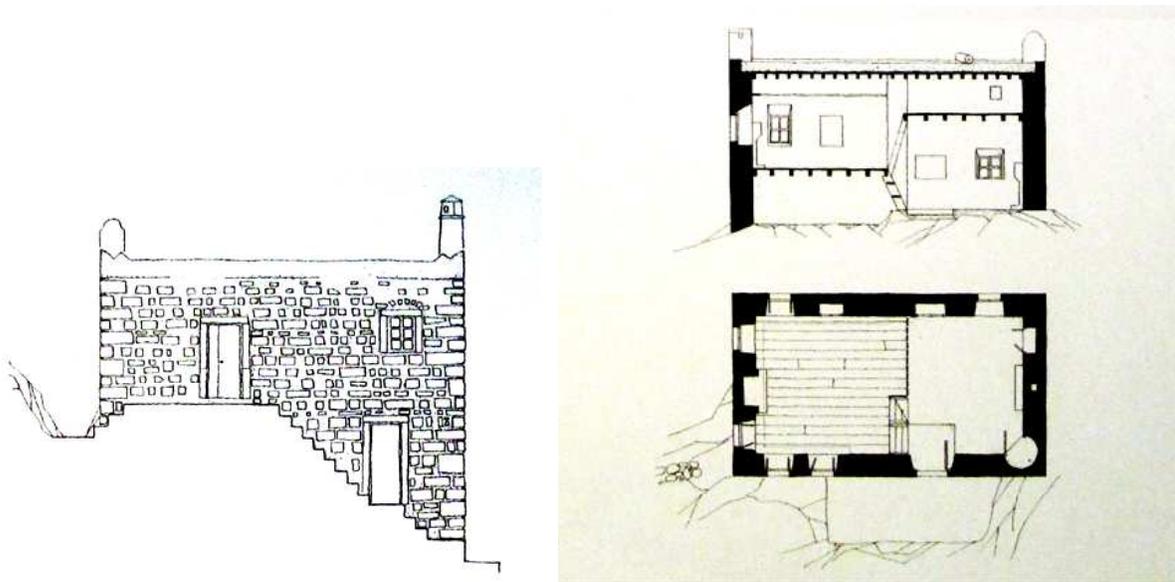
Bodrum dwellings – schematic characteristics - Façade, section and plan (Aran, 2000, p. 132)
